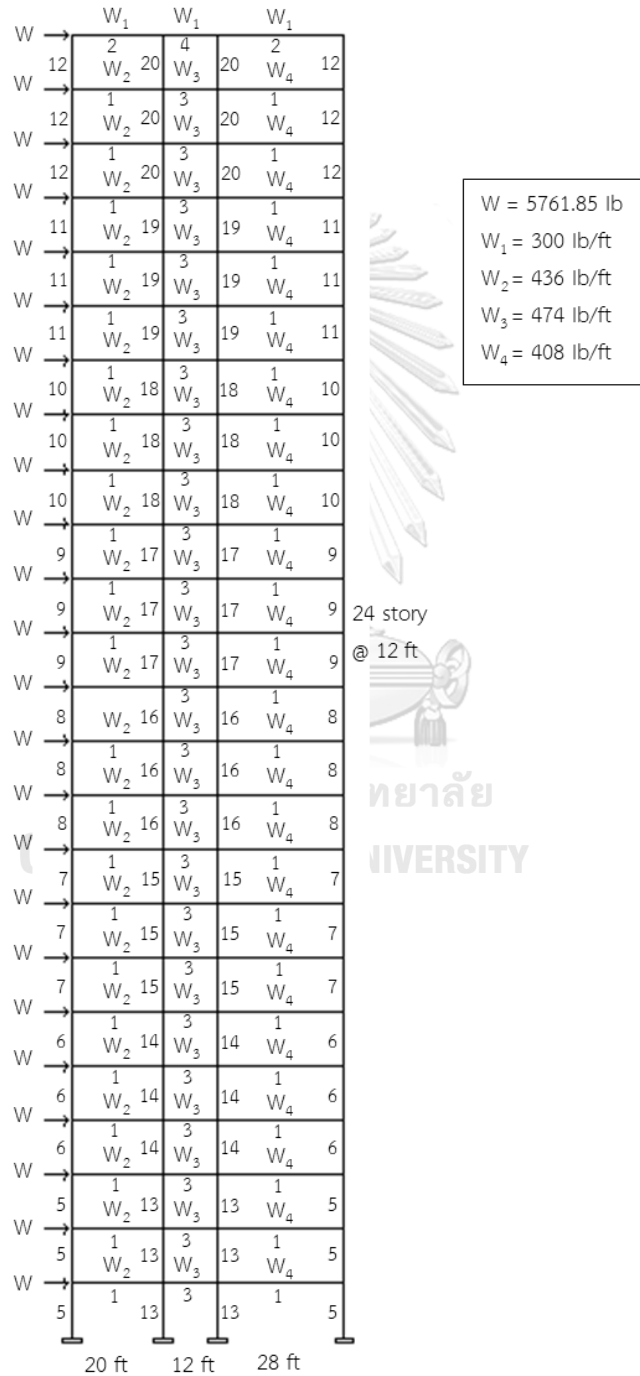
Layout and Load of three-bays, twenty-four-stories unbraced frame
